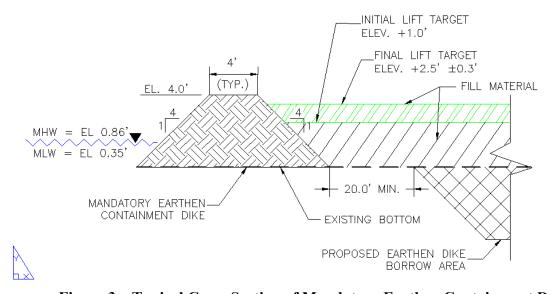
Typical Cross Section of Mandatory Earthen Containment Dikes
